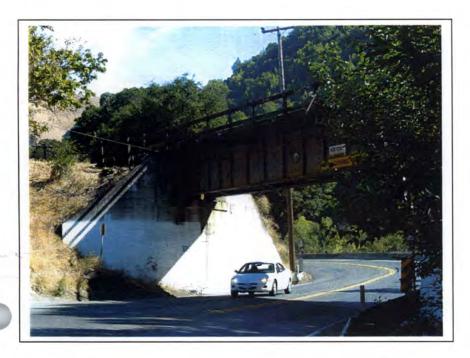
Farwell Bridge, looking east. This abutment was built in 1932, the same year this span was replaced. Portions of the original 1865 stone abutment are about 14 feet east of the newer abutment. October, 2003.
